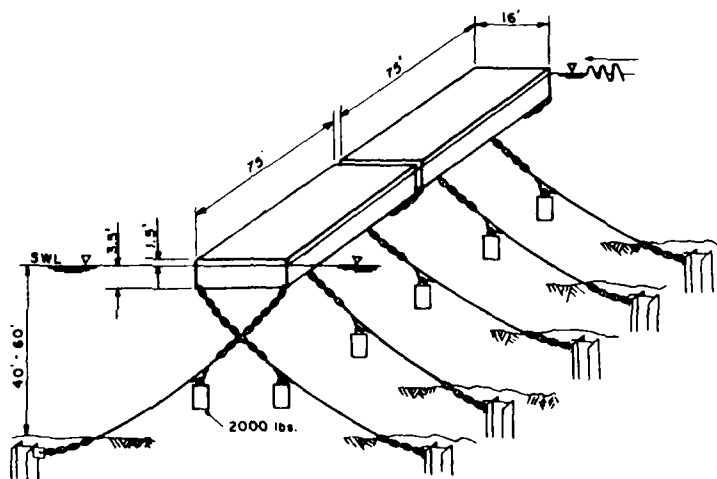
CONCRETE BREAKWATER (NOT TO SCALE)
